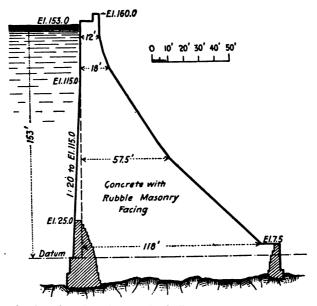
Section of Periyar dam, India; built 1888 to 1897; concrete masonry; length 1231 ft.; height 173 ft.; contains 185,000 cu. yd.
